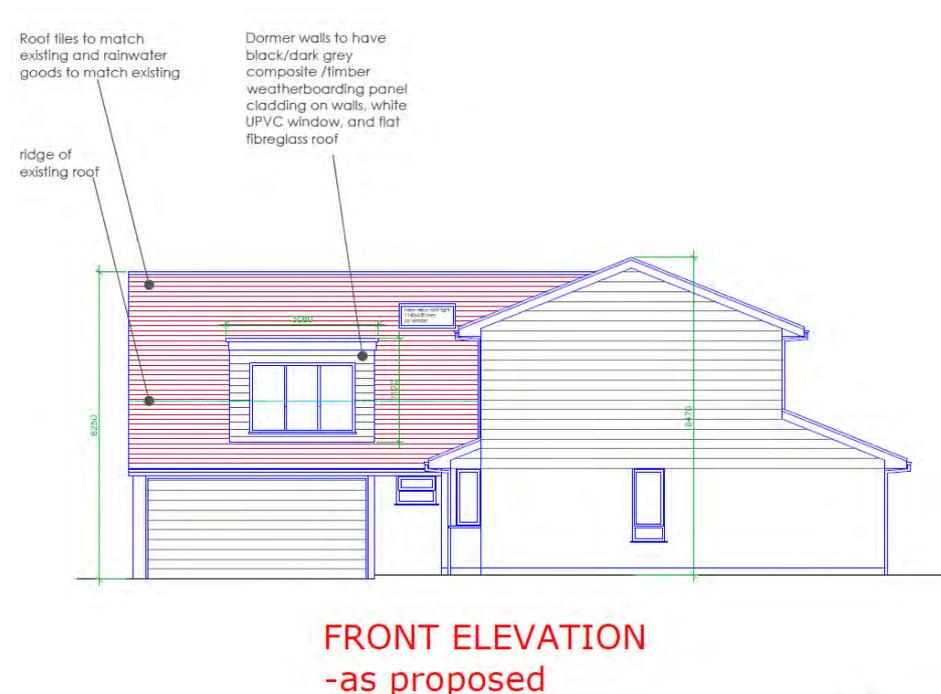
Proposed front elevation showing proposed dormer sitting comfortably within the proposed roofspace above garage.
